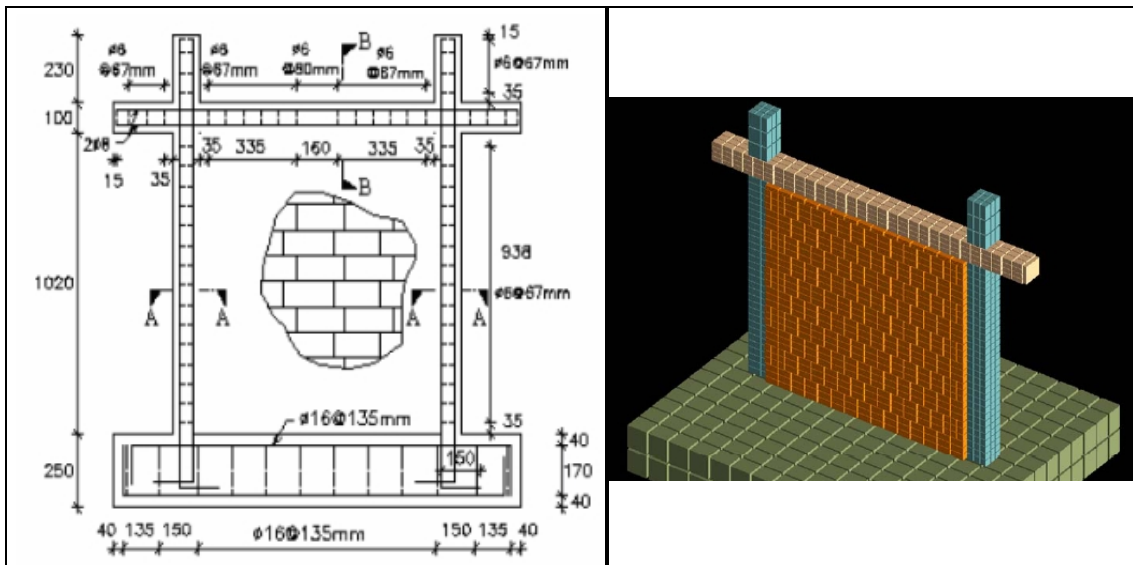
Plan view of the concrete frame with masonry infill wall and the analytical model.
